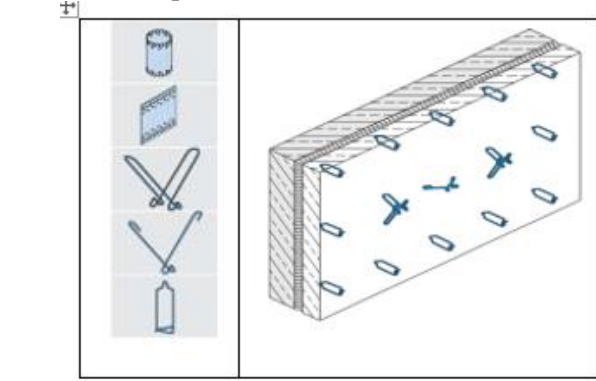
Concrete sandwich wall element Steel connectors and anchors
